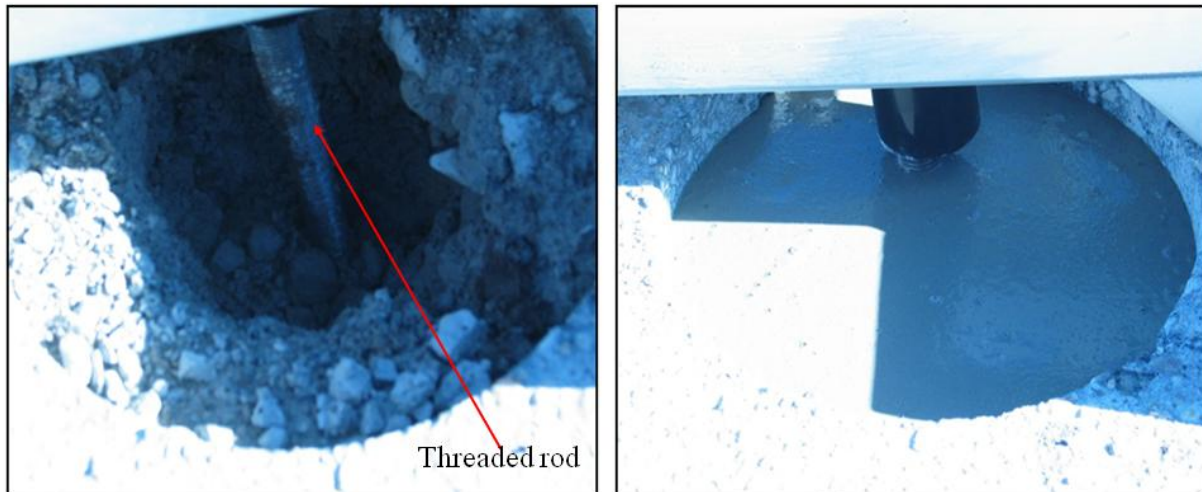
Anchor Grouting after Load Locking Manta Ray Tie-down, before (left) and after (right) Grouting
